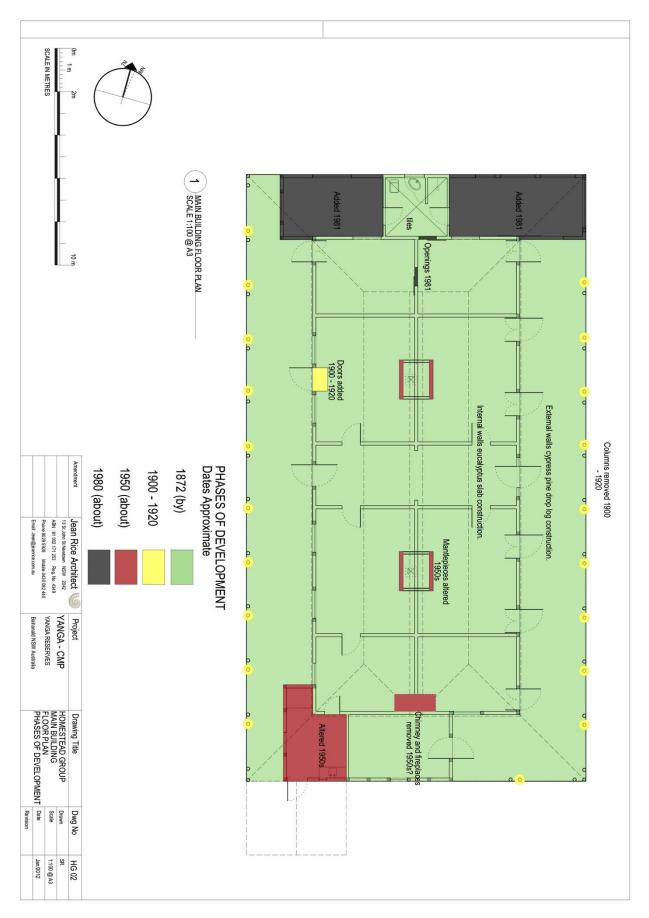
Homestead Group Main Building floor plan showing phases of development. Areas coloured green are the original structure except that the cladding has been added internally. Jean Rice Architect, site assessment 2009.
